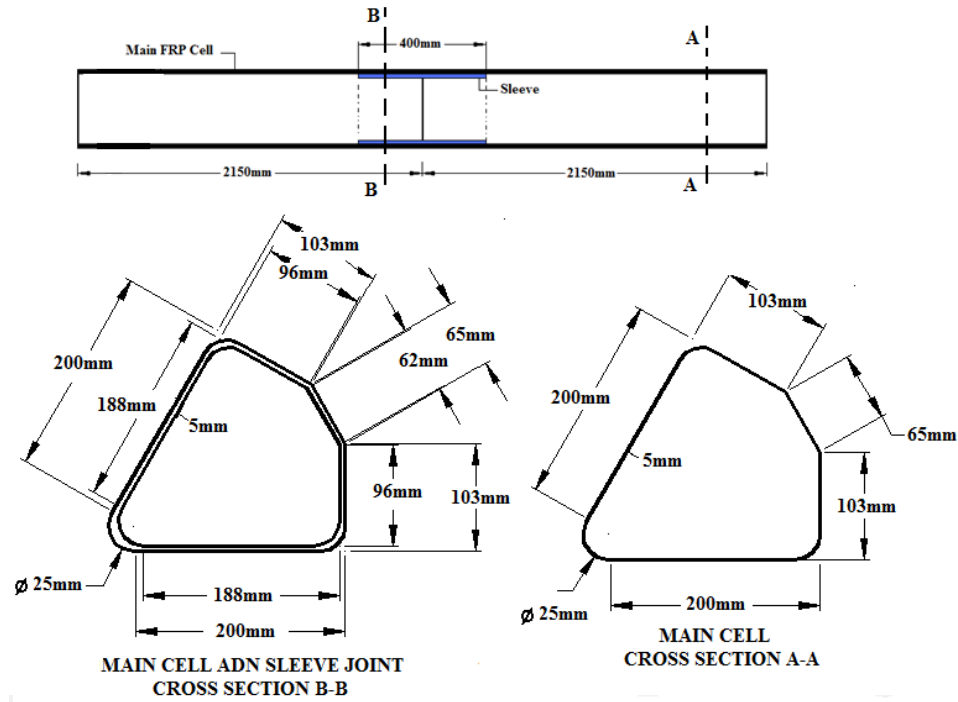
Schematic drawing of tower cell and sleeve joint
